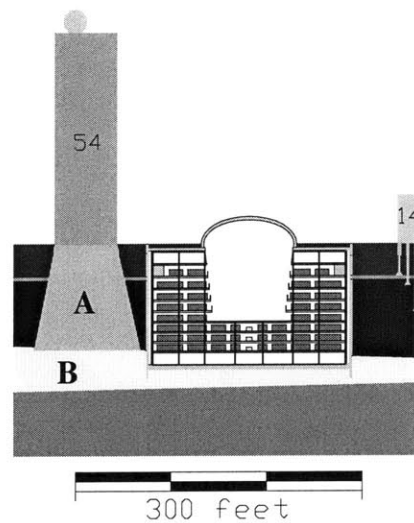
Subsurface Detail in the North-South direction of McDermott Court (see Figure 3.1-1 for plan view location and Figure 3.3-2 for legend): the underling gray zone (A) under Building 54 indicates the pile foundation bearing on the till (B).
